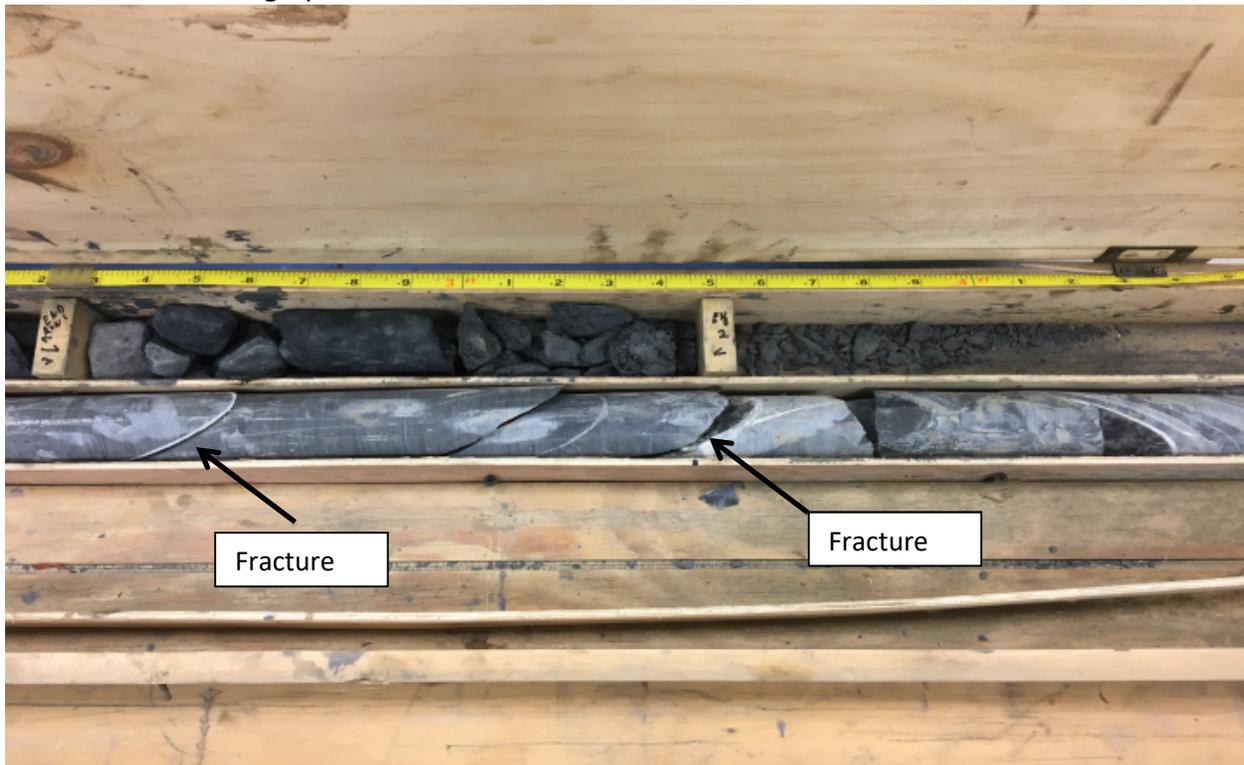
Boring B-4: Core Run 1 (63.5' – 66.0') and Core Run 2 (66.0' – 67.8'). Note: B-4 core recoveries low. Boring B-3: Core Run 1 (93.5' – 98.5')
